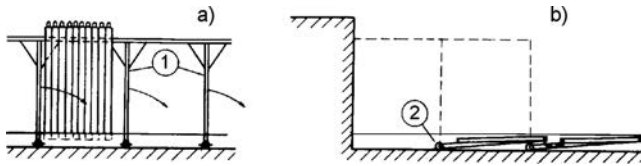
Poiré gate; (a) longitudinal section; (b) cross-section.
